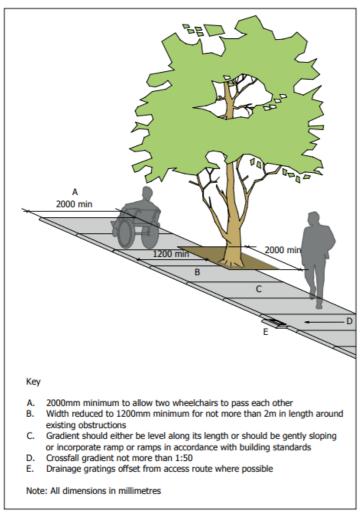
Urban Environment Pavement Layout (Note: Extracted from NDA *Building for Everyone: A Universal Design Approach*)
